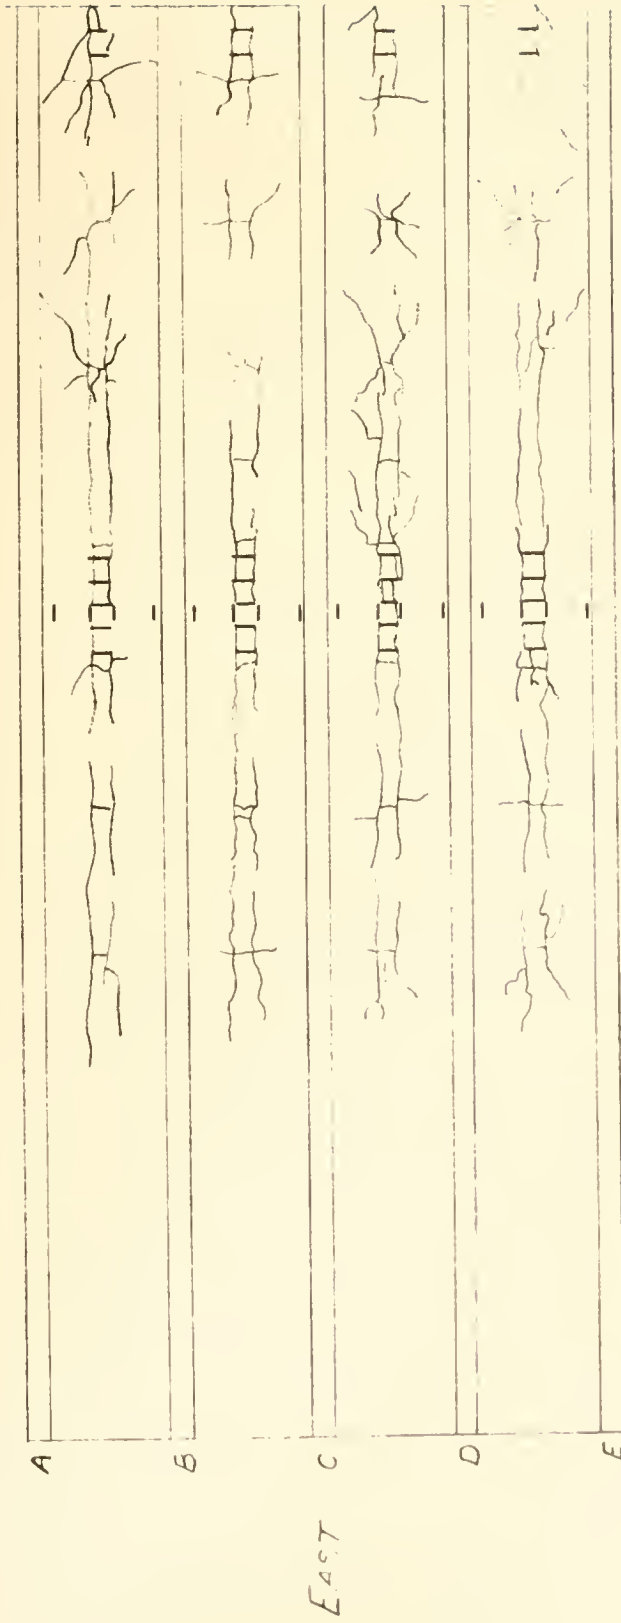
CRACK PATTERN ON BOTTOM OF SLAB AFTER CRACKING TEST,
